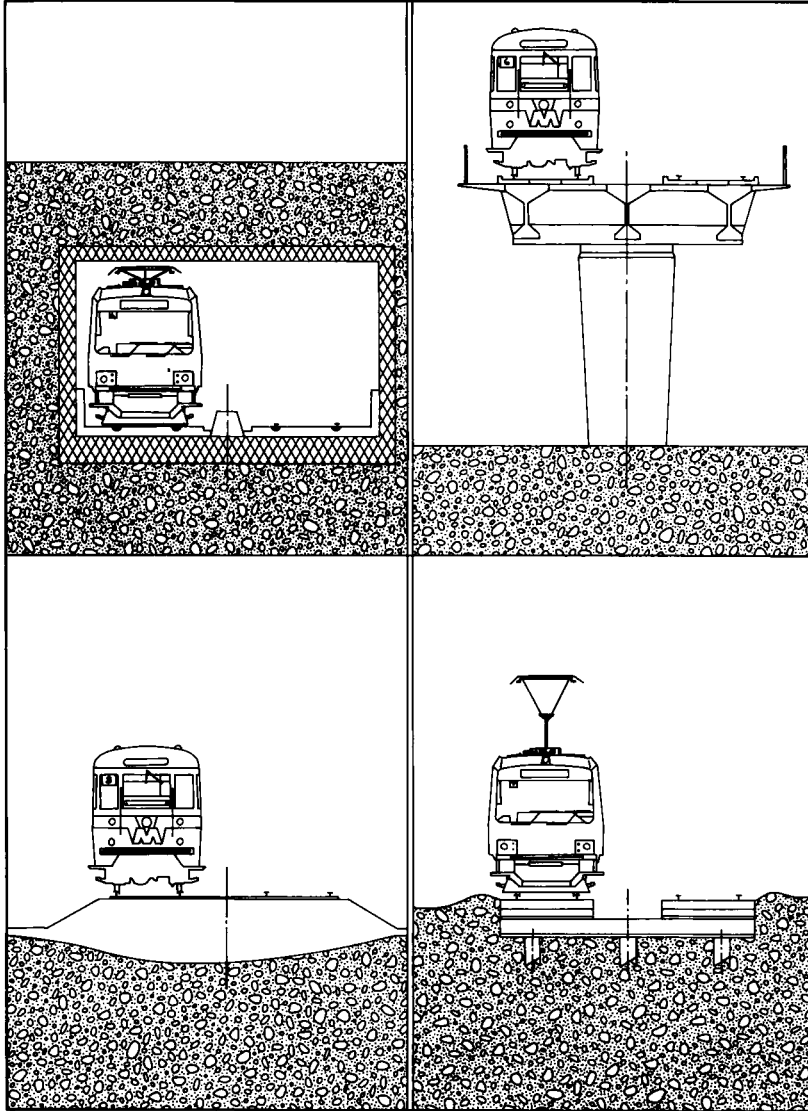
Metro structures; tunnel, viaduct, earth embankment, pile-supported track
